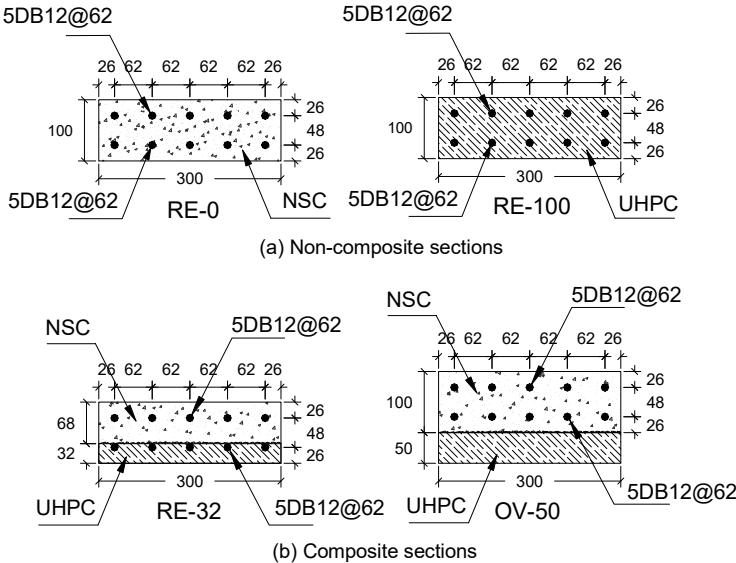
Details of non-composite and UHPC-concrete composite sections (all dimensions in mm) [7].
